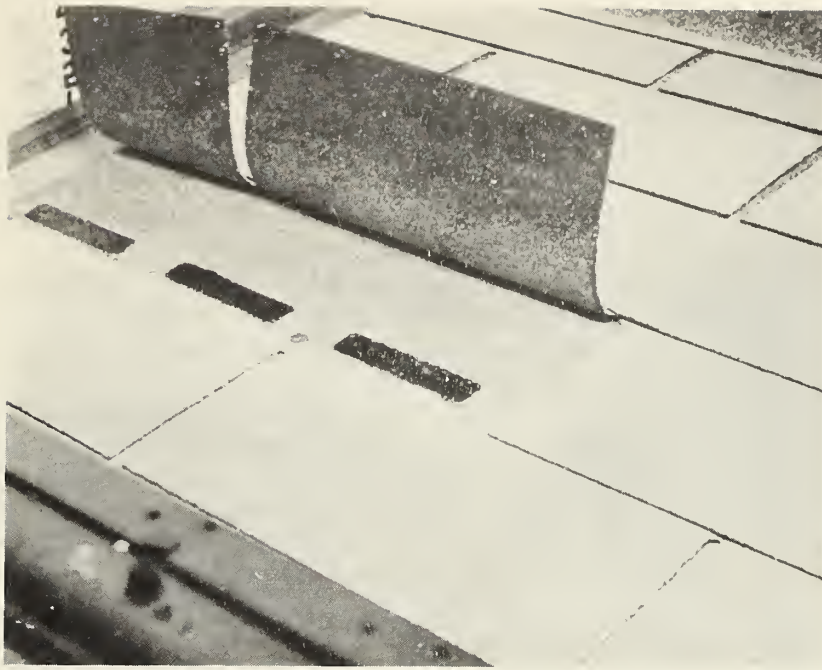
TYPICAL EXAMPLES OF FAILURE.
